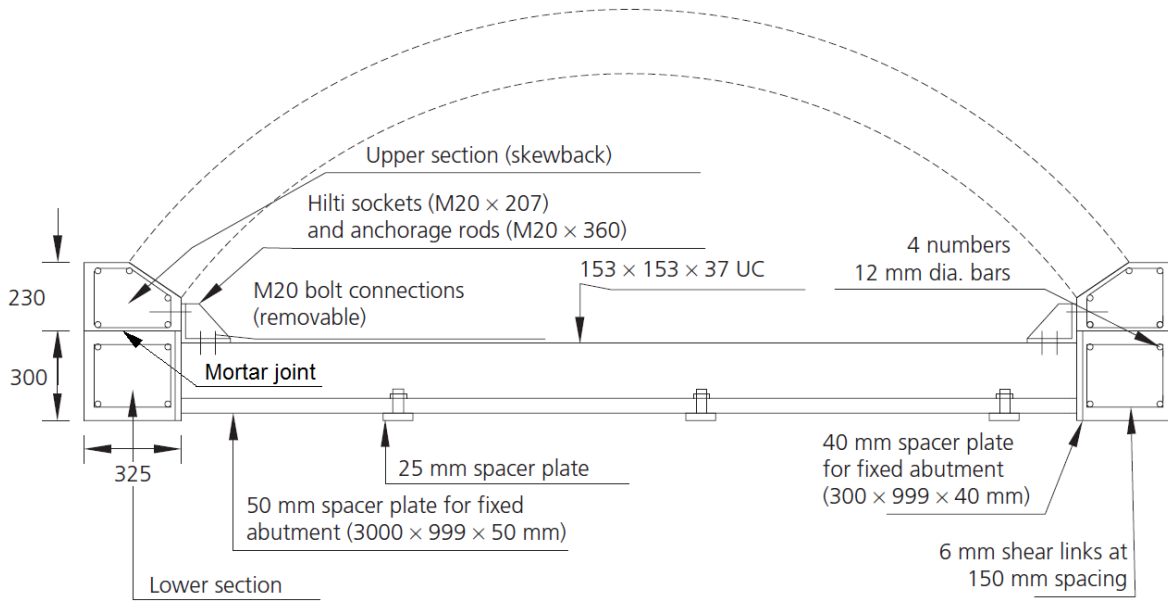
Geometry, arrangement and construction of the abutments and arch
